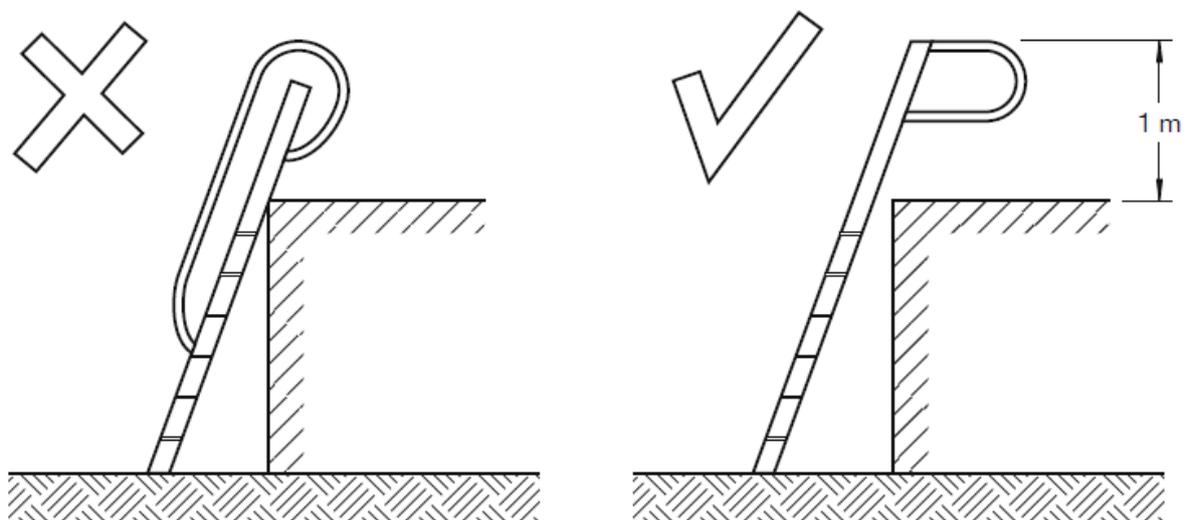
HANDRAIL DETAIL AT TOP OF INCLINED LADDER
